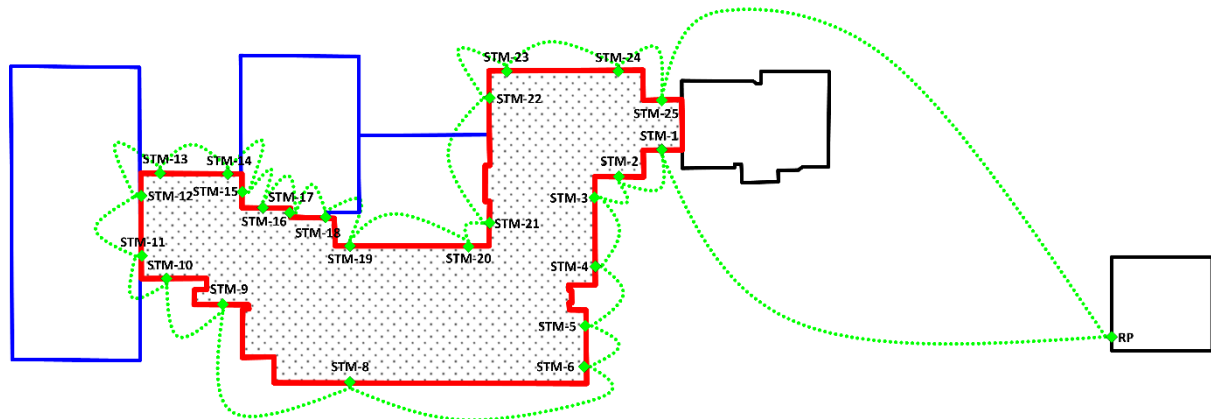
Location of wall marks at the study object (red: monitoring building; black: existing buildings; blue: new buildings; green: Class II leveling survey)
